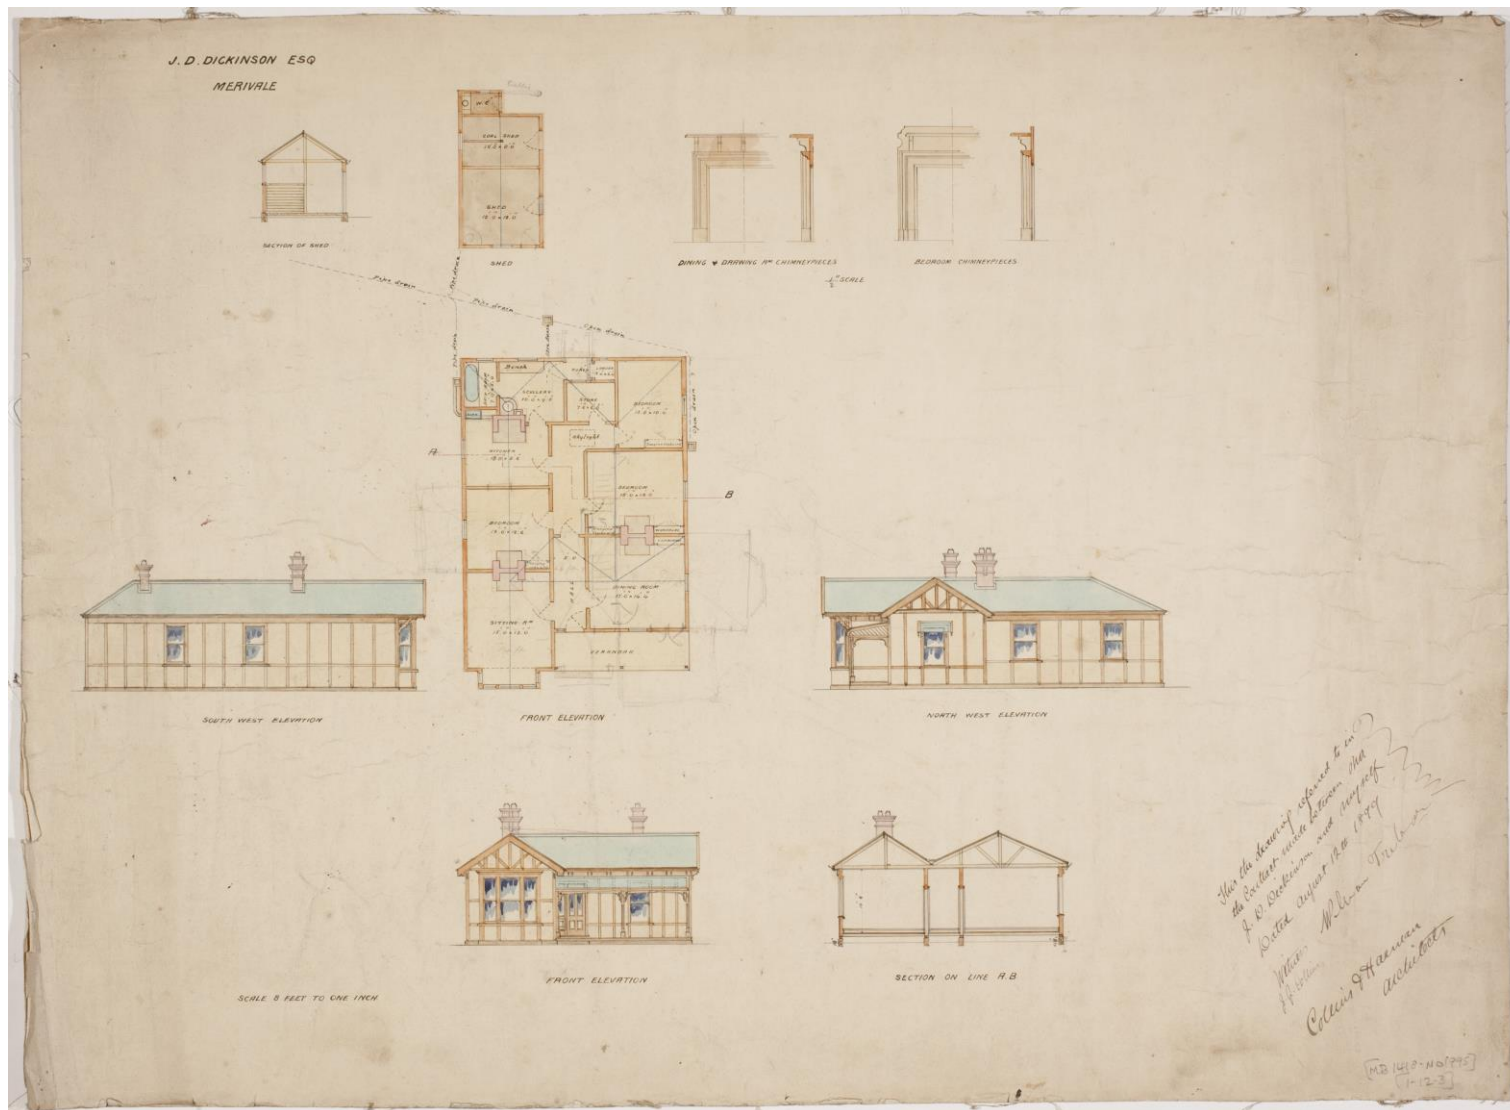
Collins and Harman, J. D. Dickinson, Esq., Merivale, plans, elevations, sections and details (1899).
